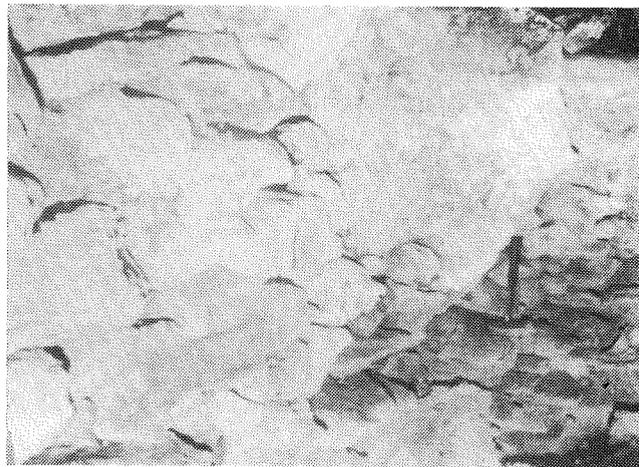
Wall constructed beneath the railbed parallel to the cave system (Photo: A. McConnell)
